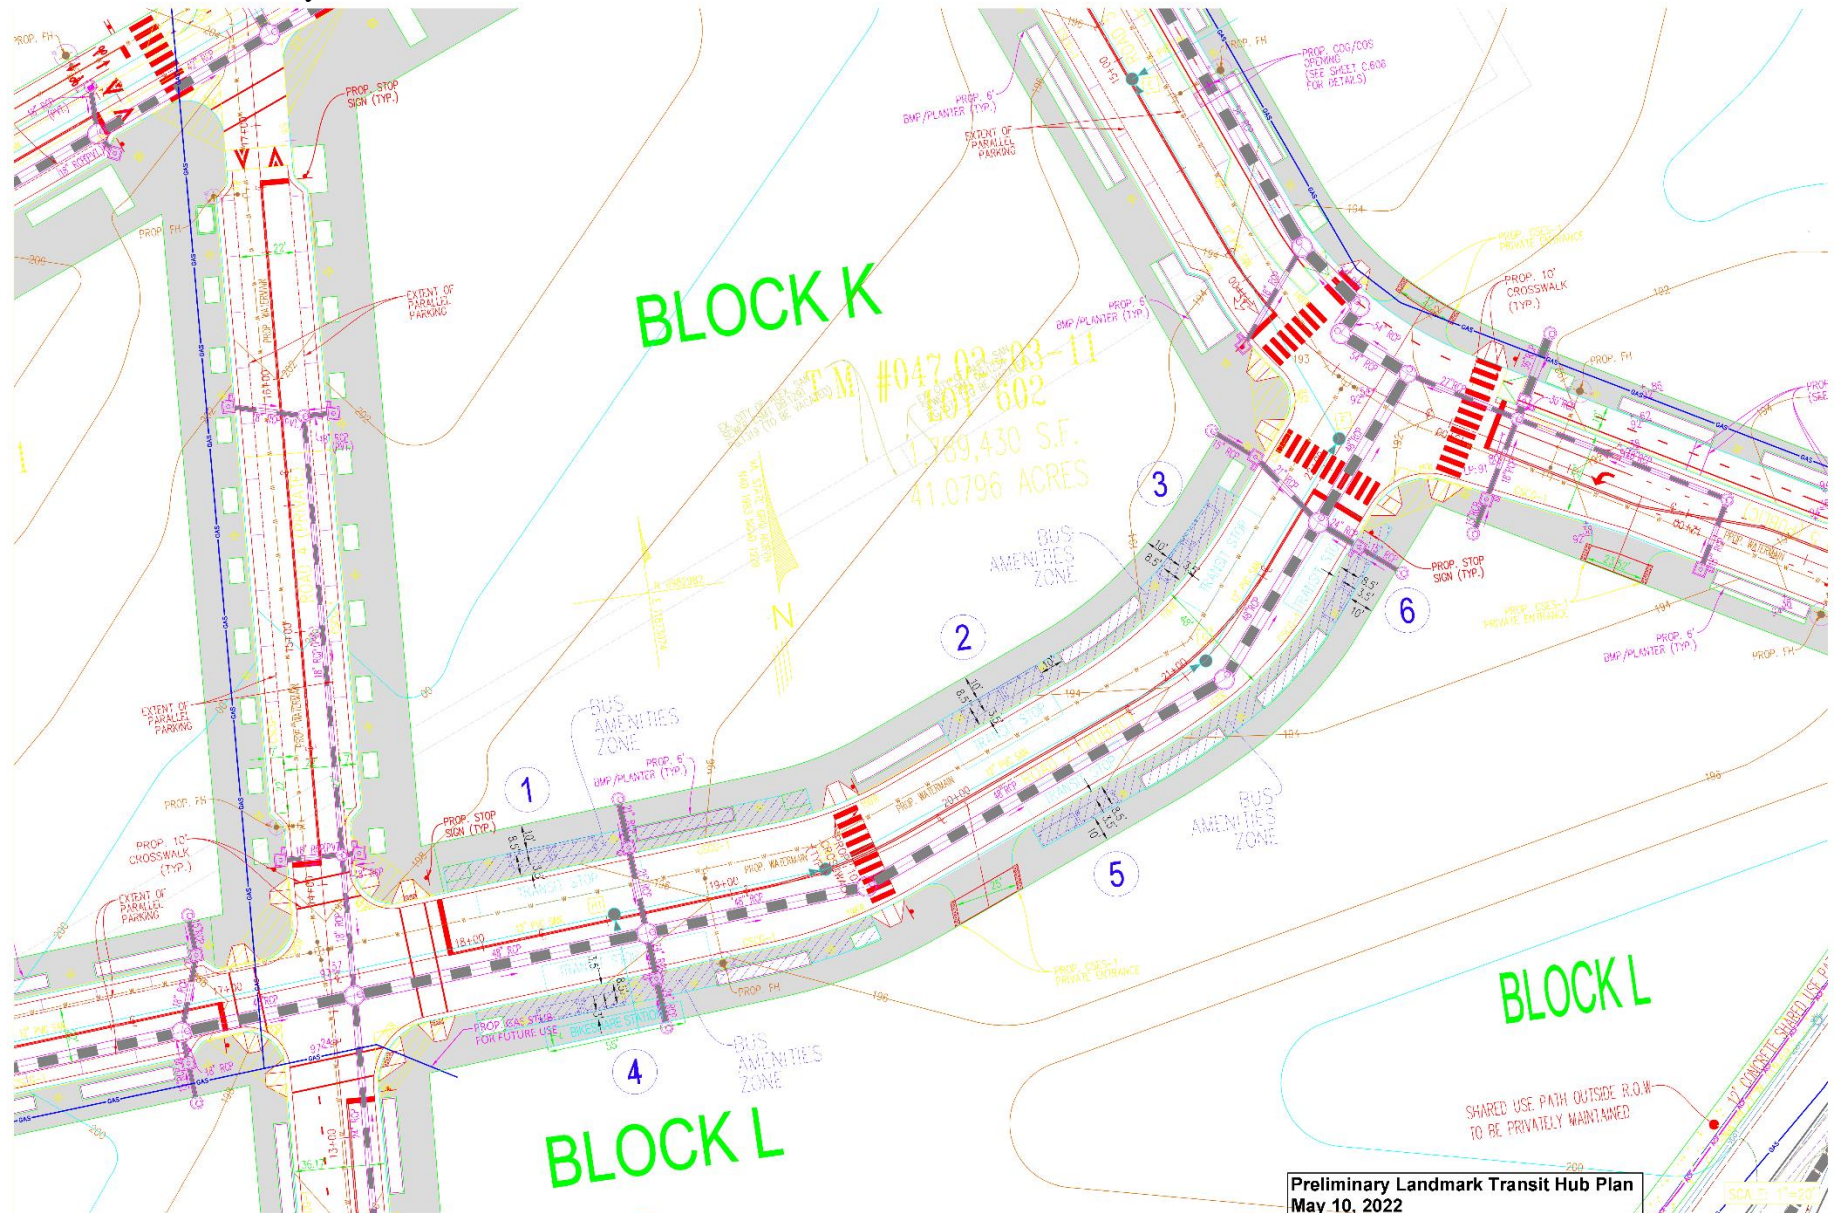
Exhibit A - Crosswalk Alignment for Intersection of Roads 1 and 6
